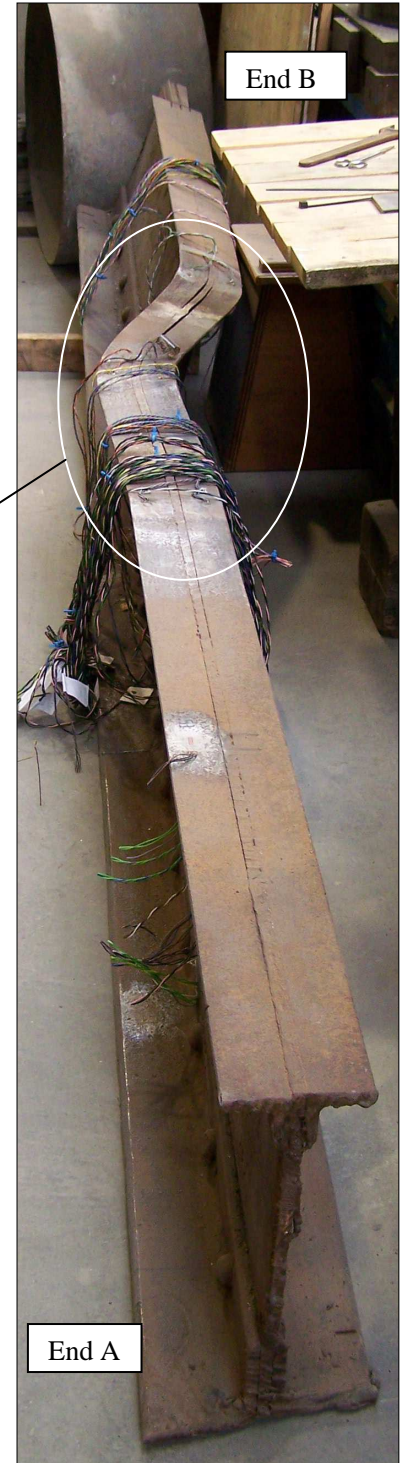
Beam after test to failure (Photo by M.O'Sullivan 2009)
